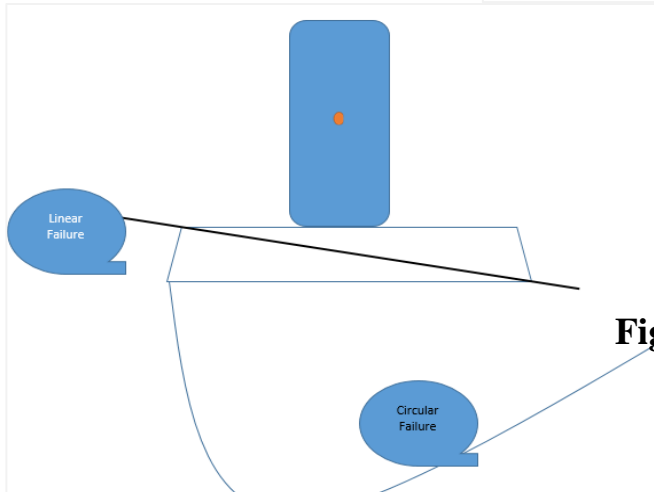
Linear and Circular failure due to foundation plate sliding
